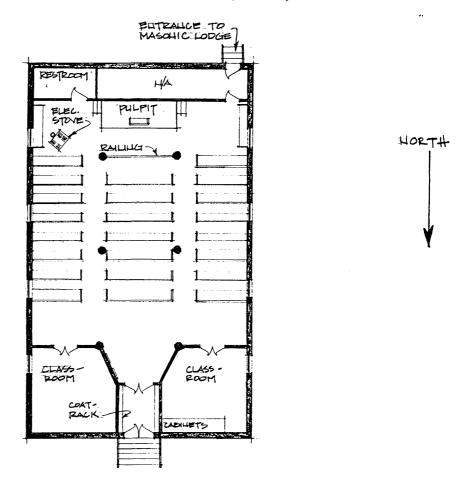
The main floor plan of the Hurricane Mills Meeting House (not to scale).
